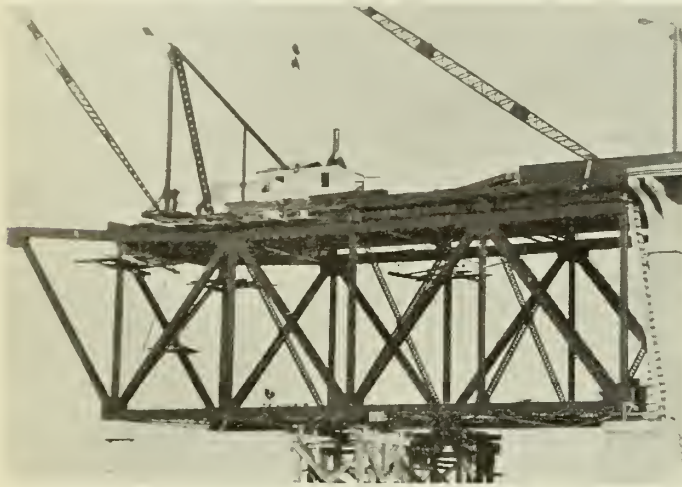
Span 13 Supported on Pier 14 and on the First Temporary Pier.
